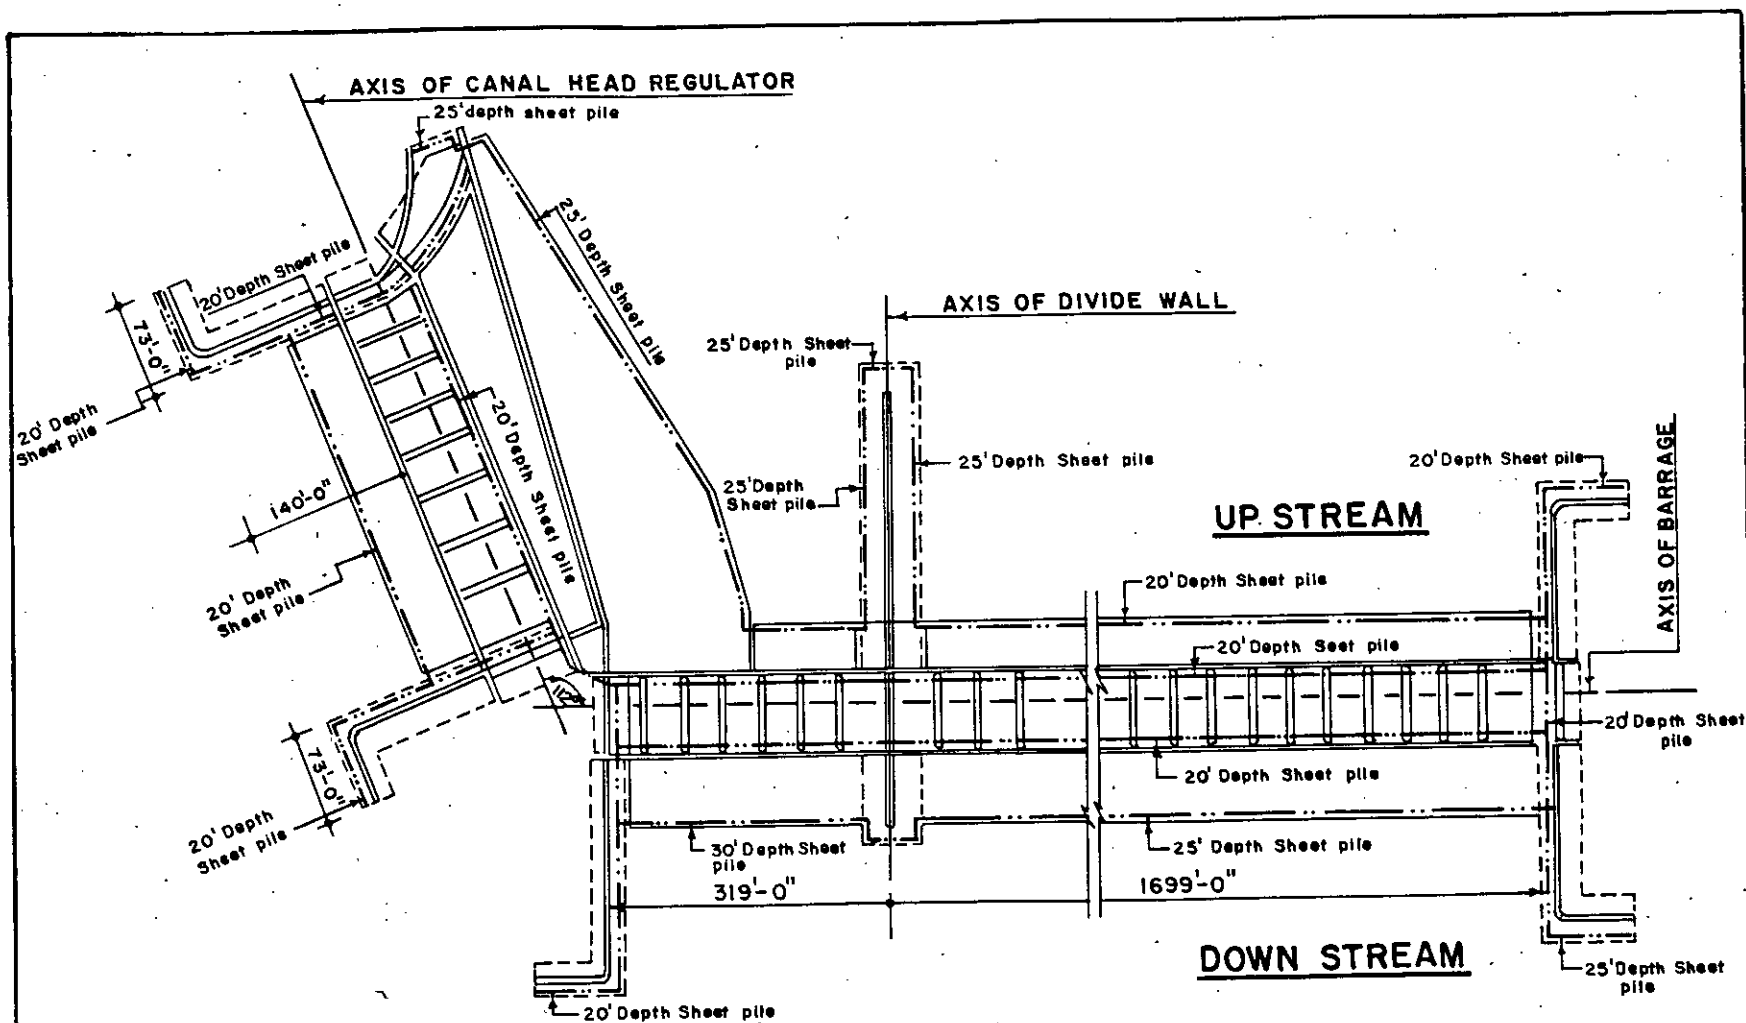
GENERAL LAYOUT PLAN OF HEAD WORKS
